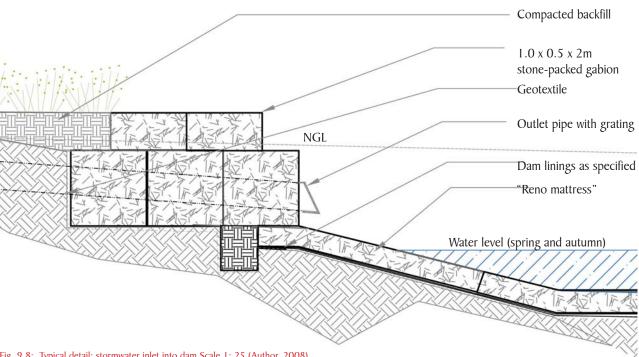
Typical detail: stormwater inlet into dam Scale 1: 25 (Author, 2008)
